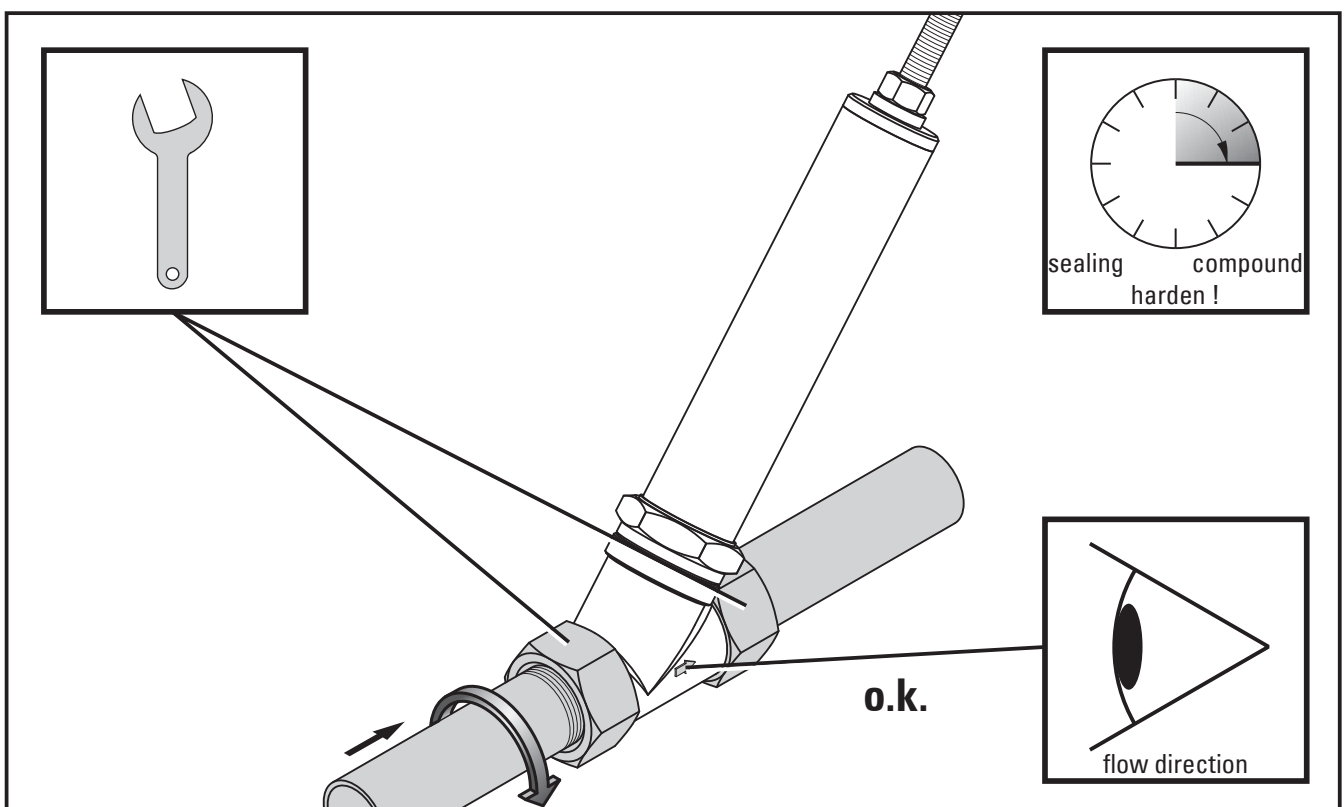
spill valve, mounting with threaded connection (Fig.: Art. UV330125)
